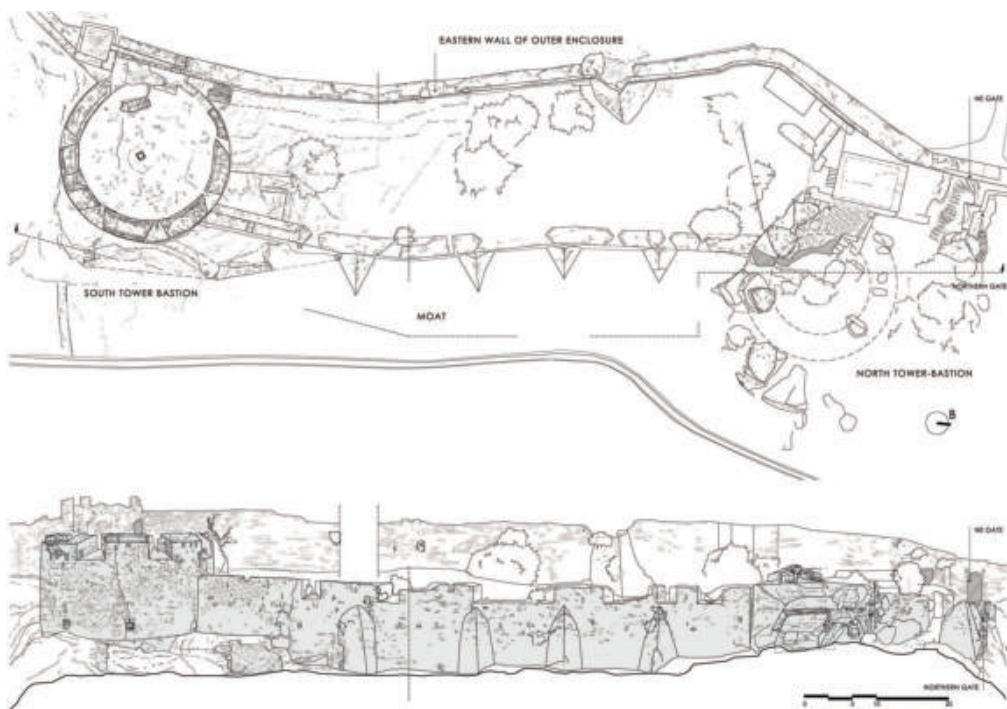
Livadye kalesi-existing condition ground plan and eastern elevation (Simou, 2020)
